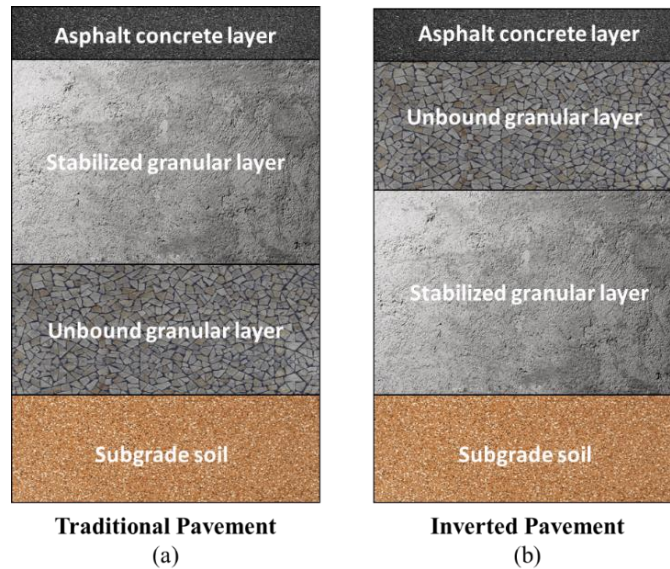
Typical layer configuration of a traditional pavement structure (a) and an inverted pavement structure (b).
